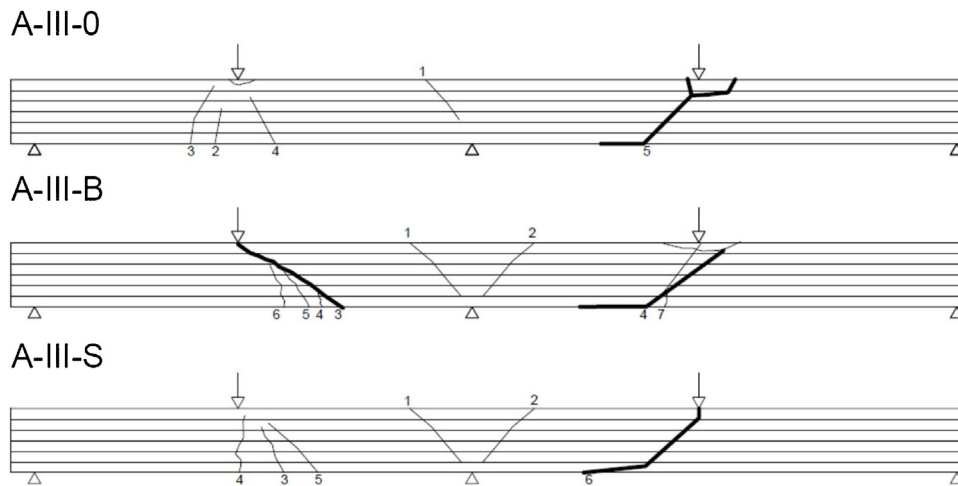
Crack pattern in A-III series beams (destructive crack was marked with a thick line).
